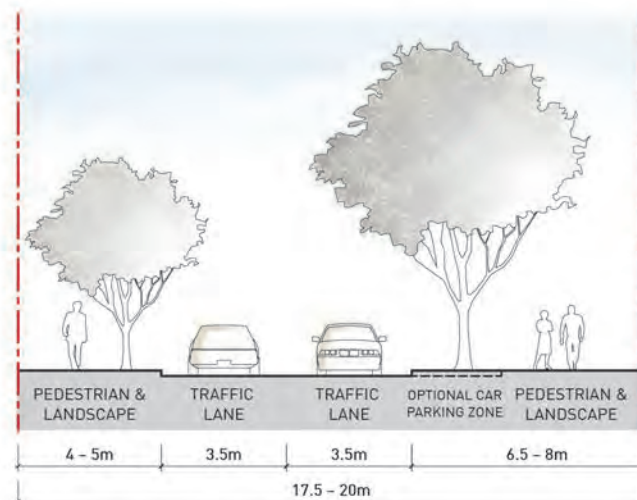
SECONDARY ROAD (17.5 - 20M)
